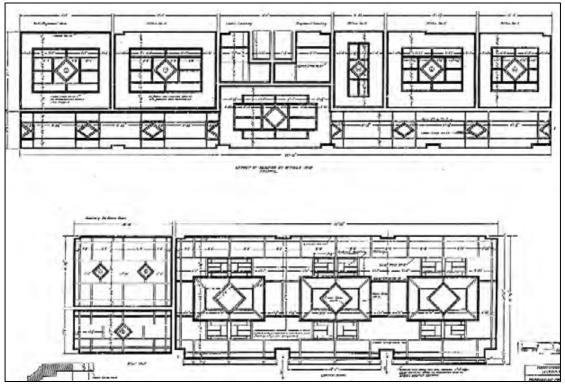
Plan of ceilings on the second floor of power station (HEC plans - A5488).
